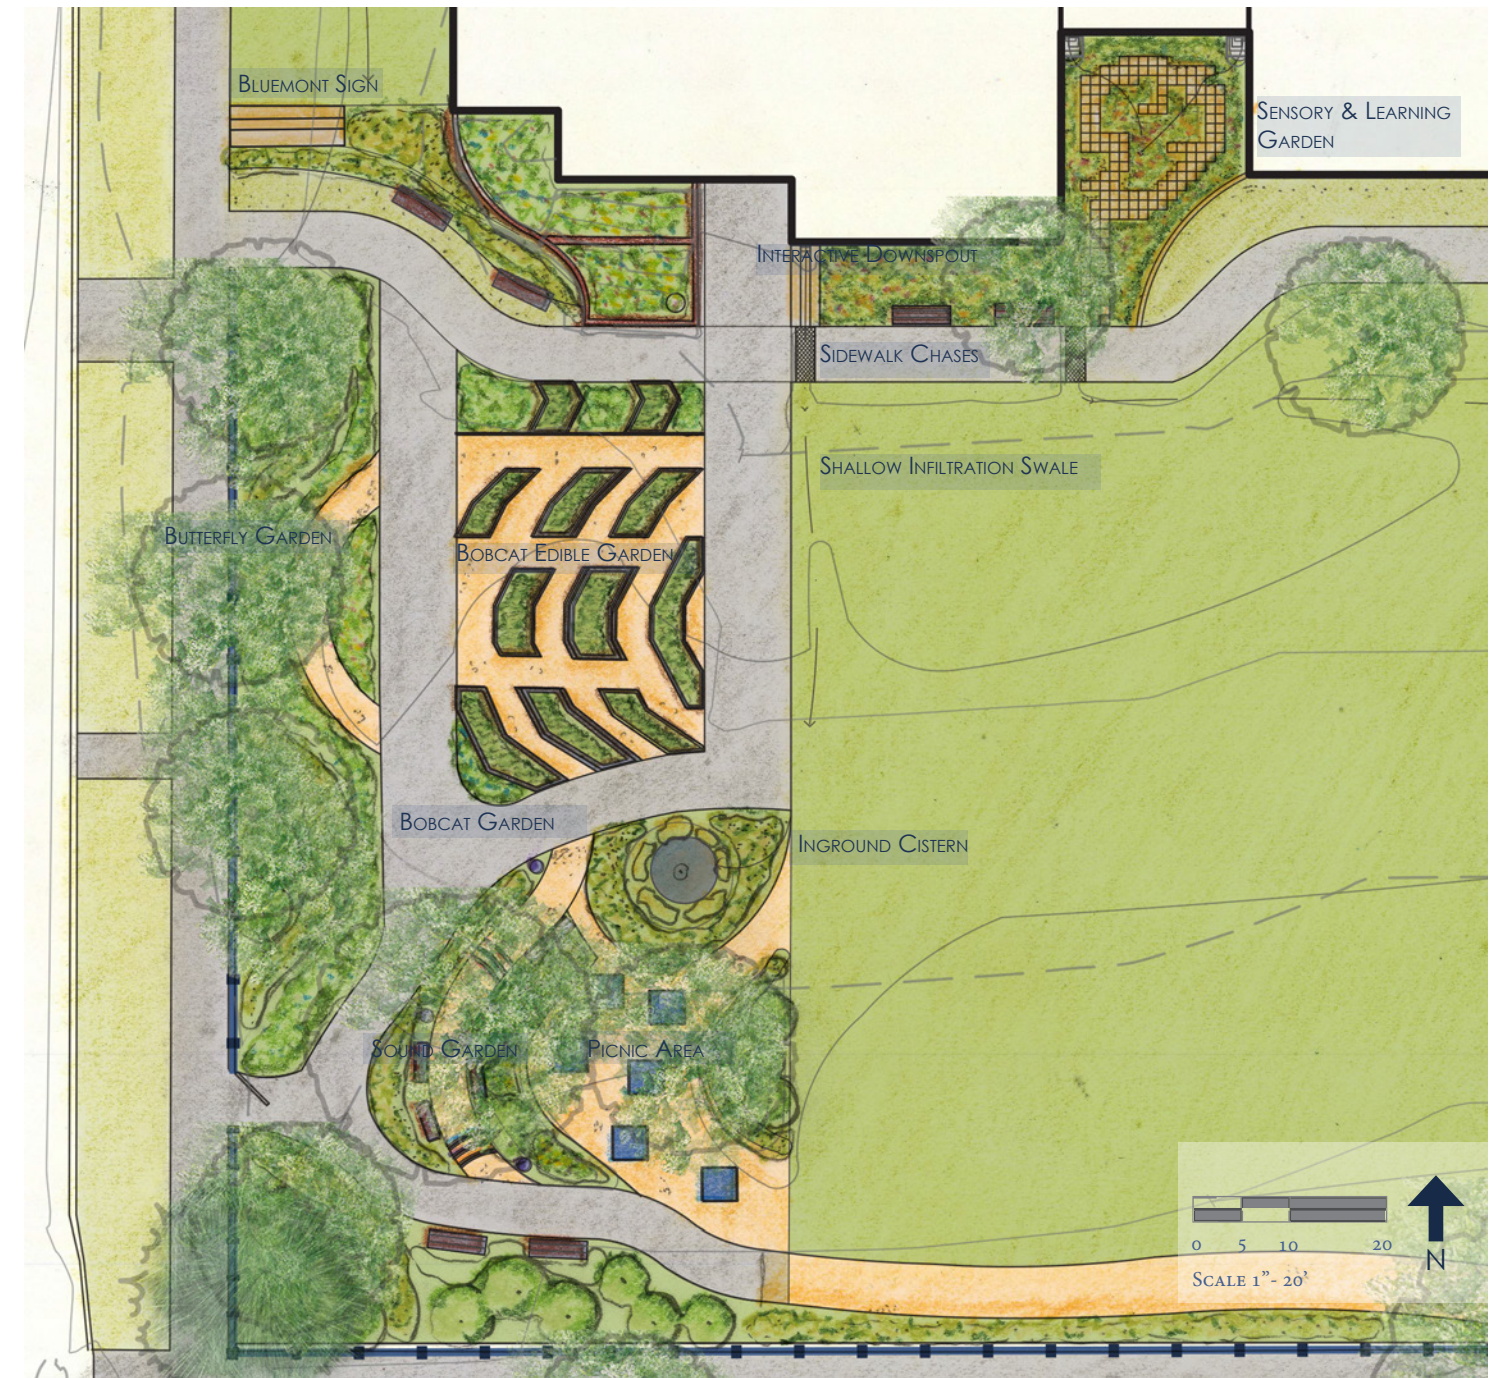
Proposed Bobcat Garden. Design by author 2014, site survey by BG Consulting.
